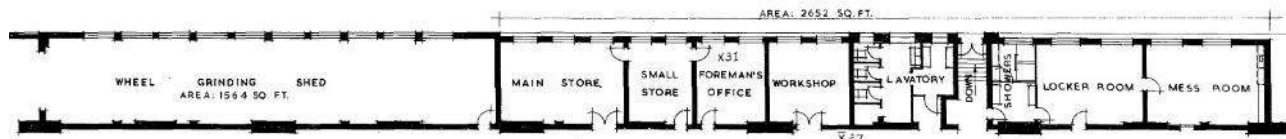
Detail of the workshop buildings from the MMTB's 1972 plan
